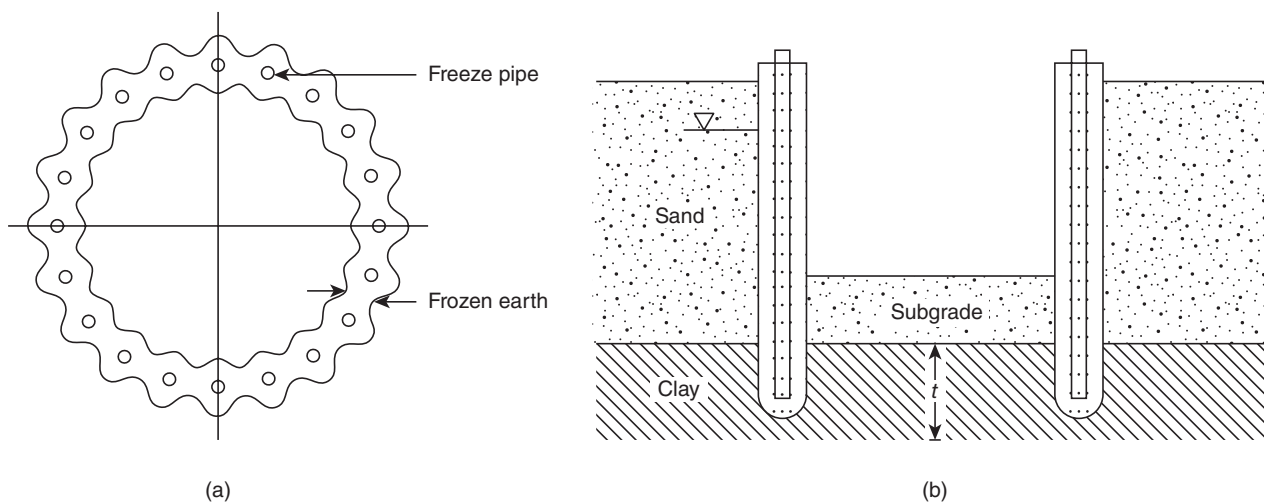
Circular excavation support by a freeze wall. (Courtesy: Nemati, 2007)
